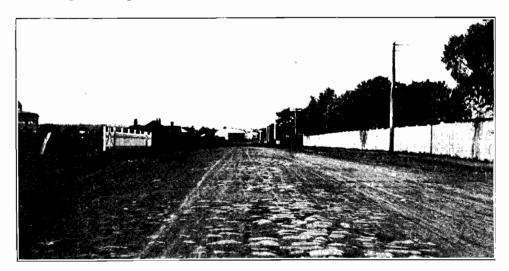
Showing section of Bendigo-road, with foundation pitchers exposed through neglect of maintenance.
